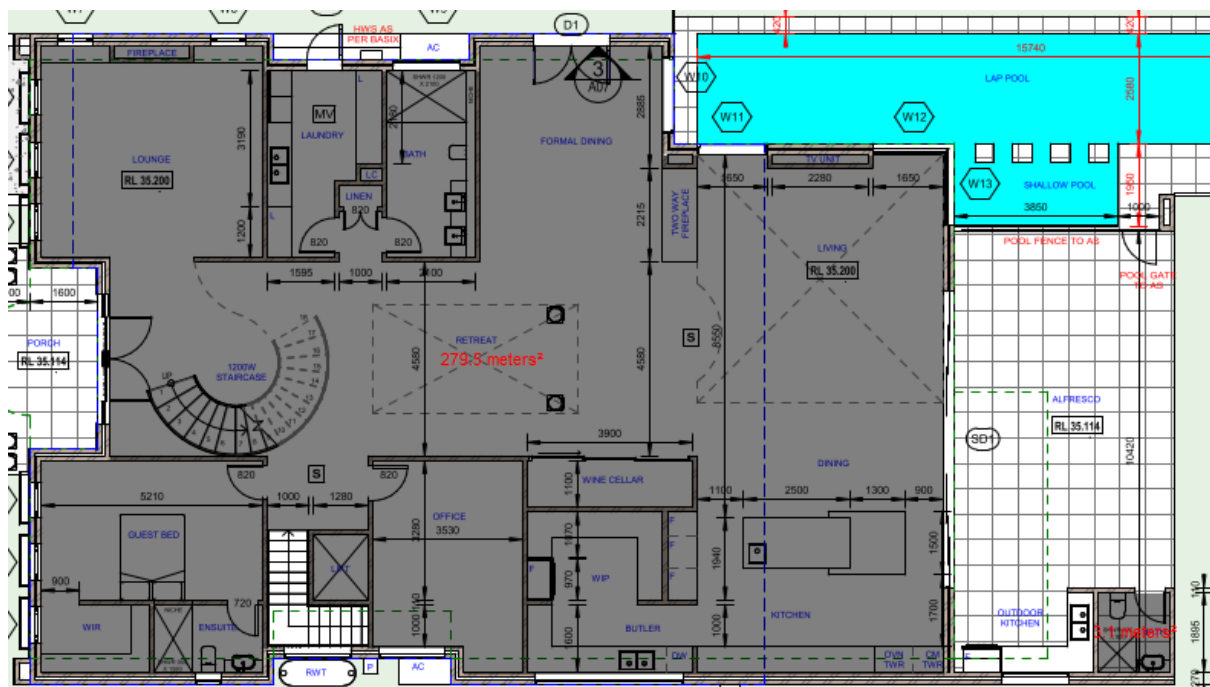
Extract of the ground floor plan (source: Nemco Design, dated 22/09/2020)
